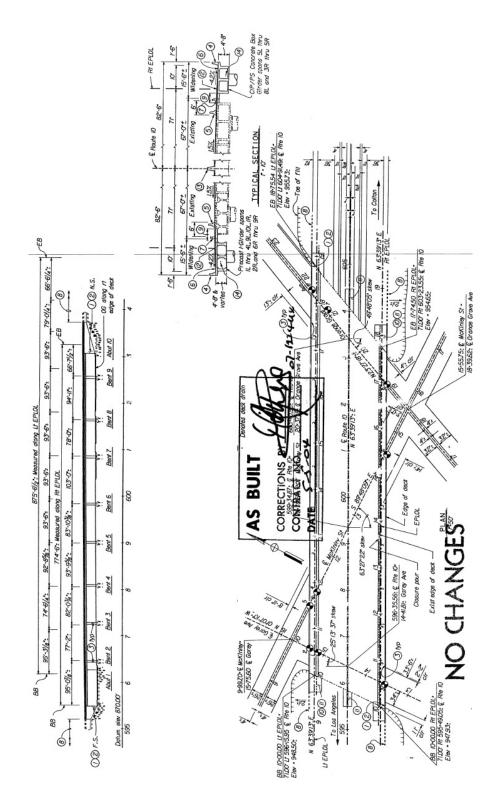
Gary Avenue Undercrossing Elevation and General Plan, After As-Built General Plans, 2004. (Note: Bent 10 and Abut 11, Abut 10 is incorrect)
